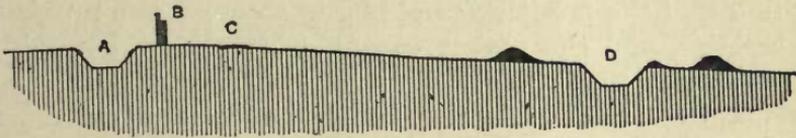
The Wall of Hadrian. A, Ditch ; B, Wall ; C, Military Road ; D, The Vallum.
